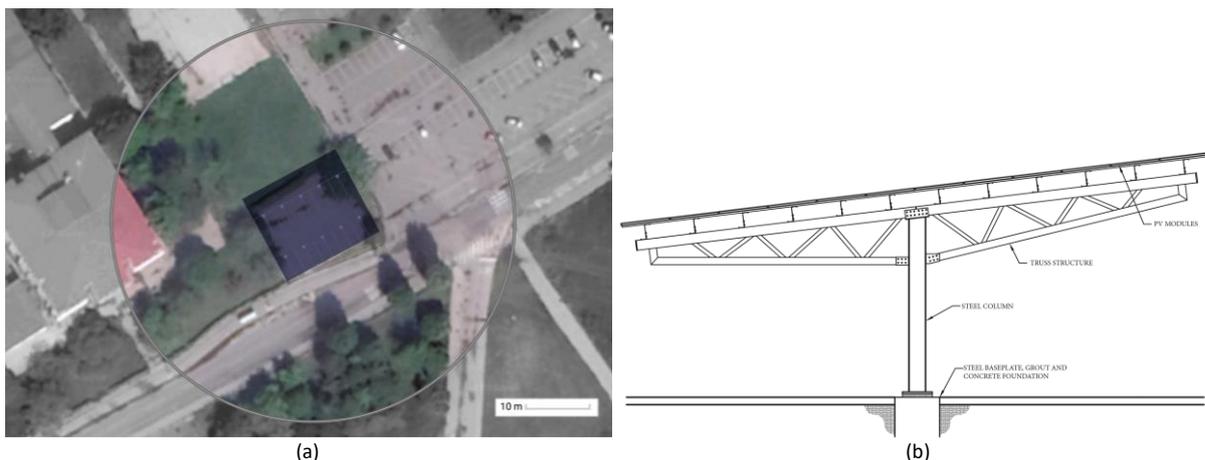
(a) Location of High School Nikola Tesla Niš parking lot and proposed solar canopy, and (b) Potential truss canopy construction
